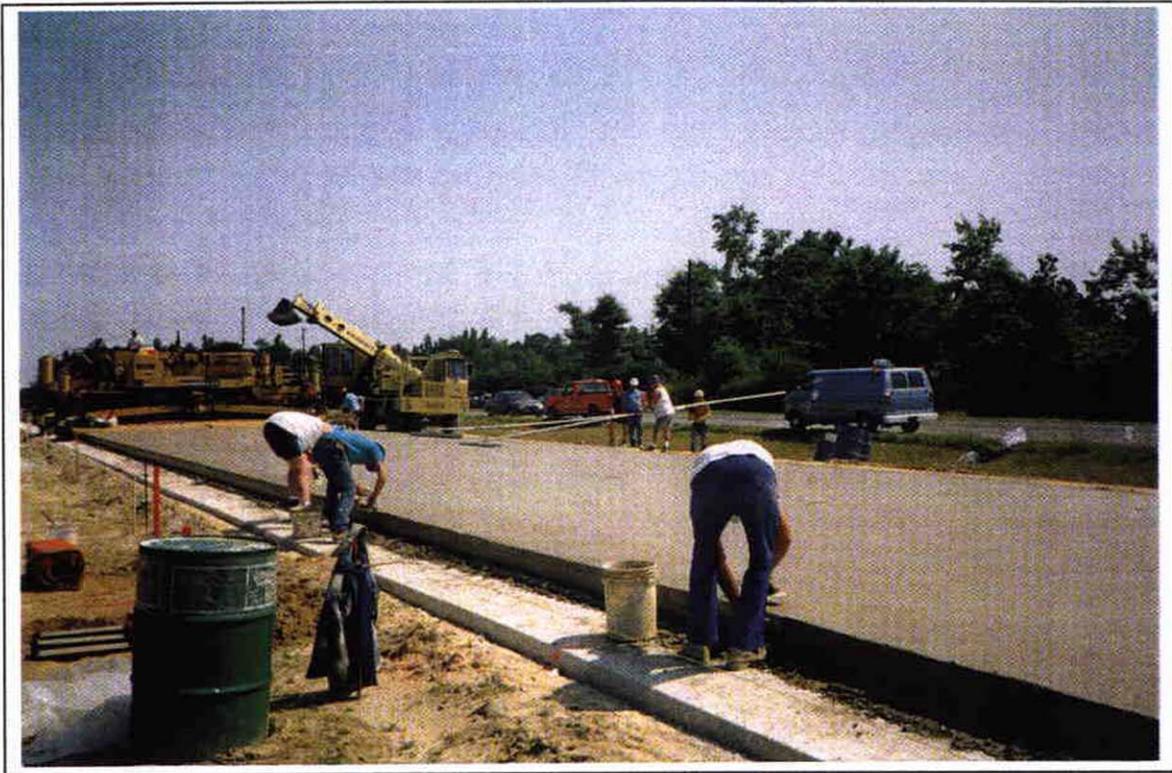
Test Section 100205. Finishing pavement edges behind the paver. Due to harsh mix, finishers are well behind the paver.
